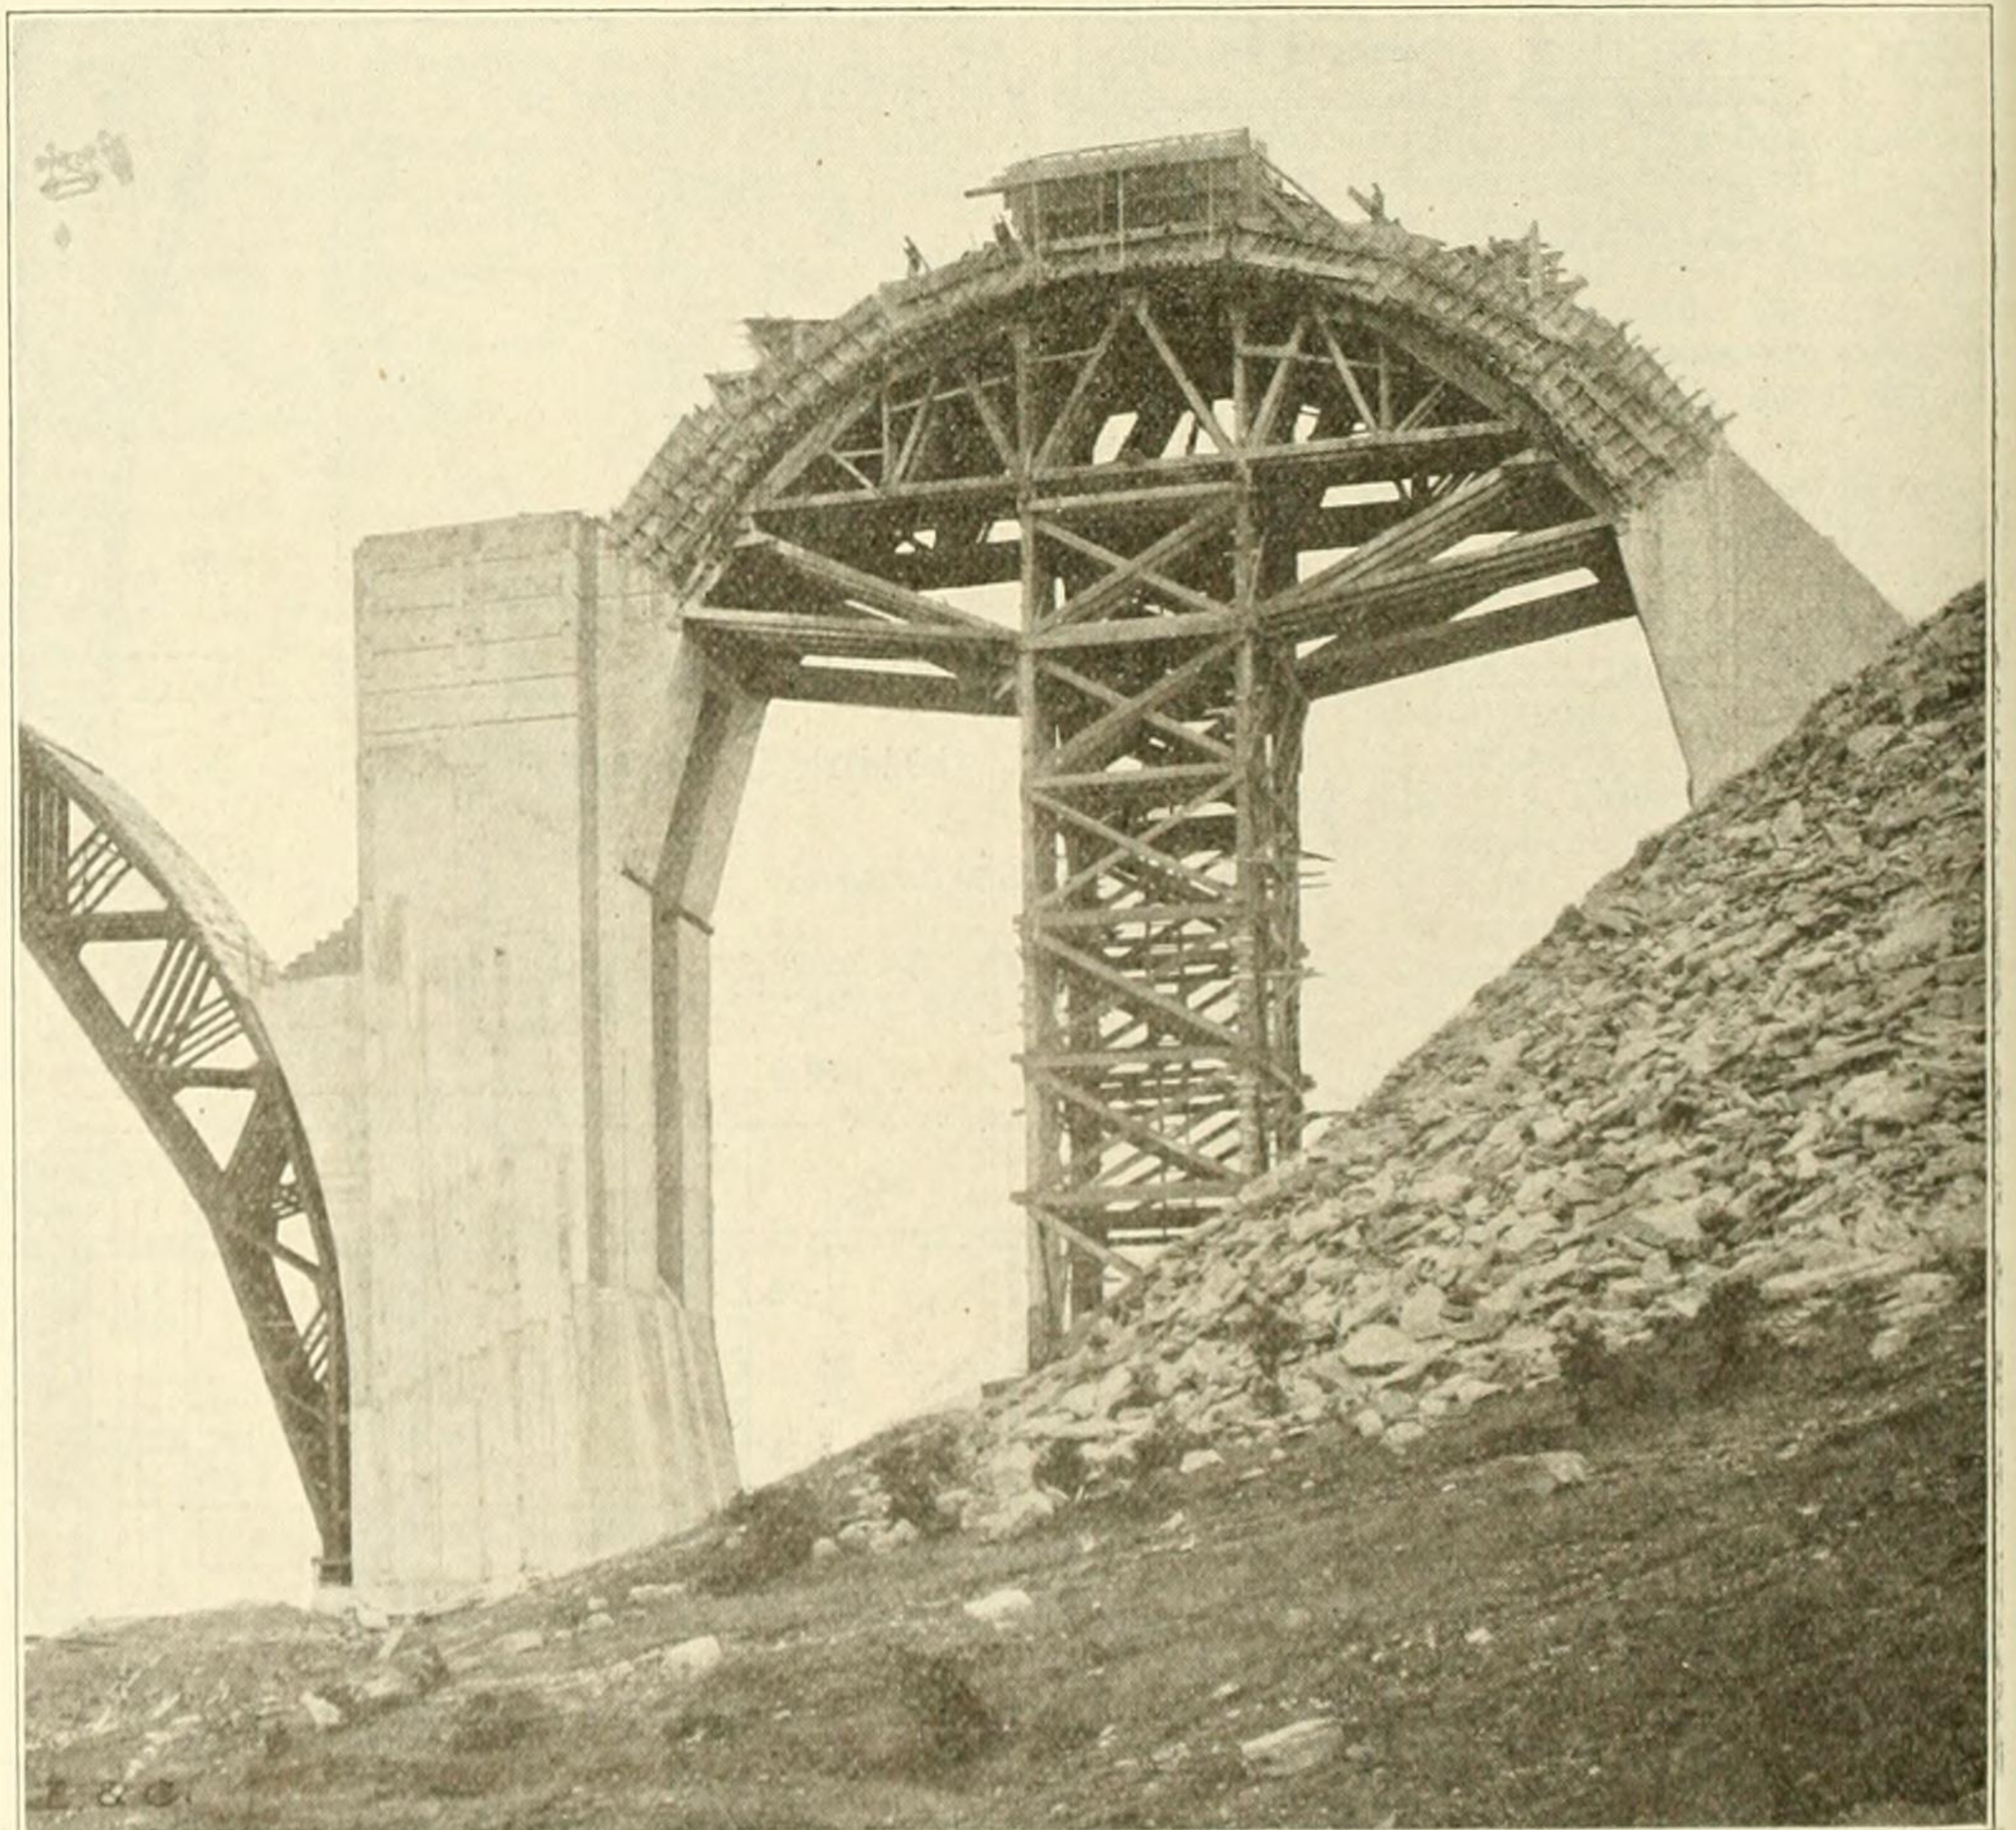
Wooden Centering and Support for 100-Ft. End Arches of Tunkhannock Creek Viaduct.
